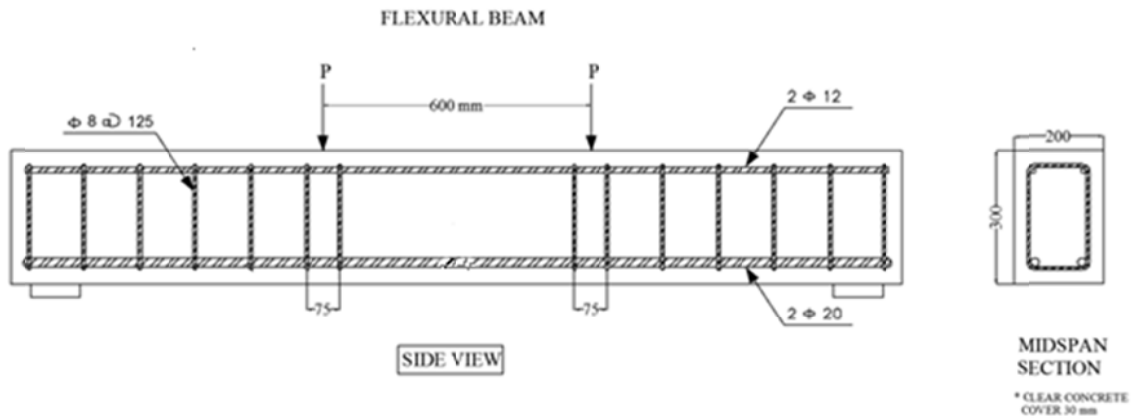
Flexural Beams - Reinforcement Details; all dimensions are in mm.
